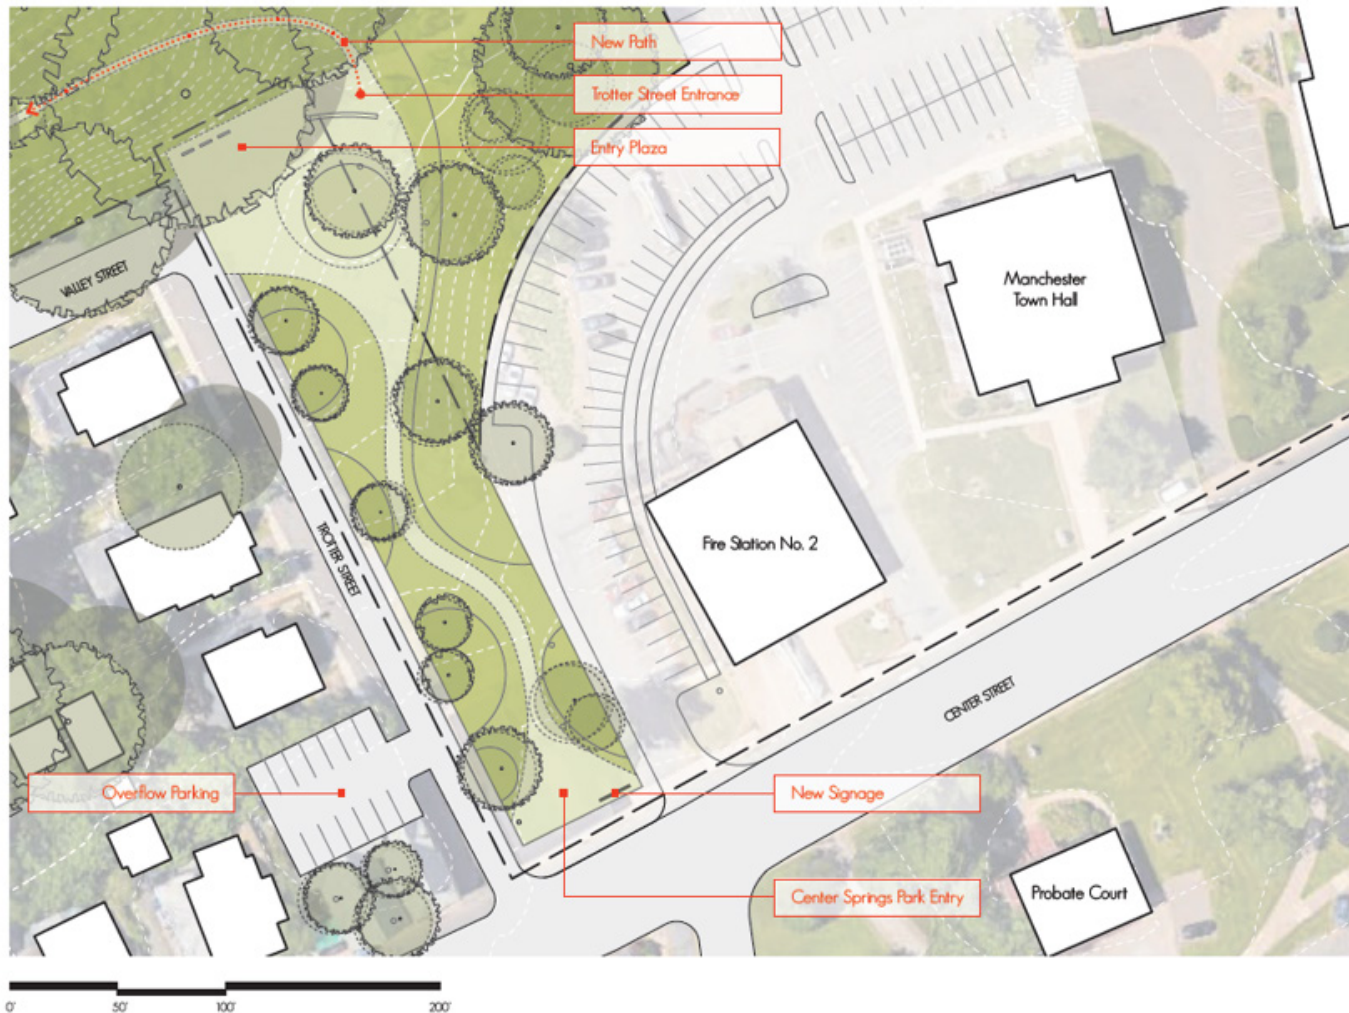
The Trotter Street gateway to Center Springs Park will be enhanced with a realigned parking area providing a walking path with views into the park and a green corridor connecting Center Springs Park to Center Memorial Park.
